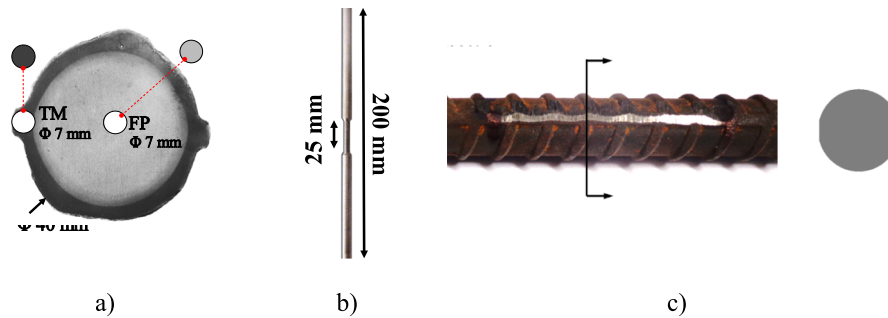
(a) Test specimen etched and showing locations of TM and FP specimens extracted, (b) typical test specimen extracted for tensile test with dimensions, and (c) longitudinal rib milled in tensile test specimen preparation of full rebar.
